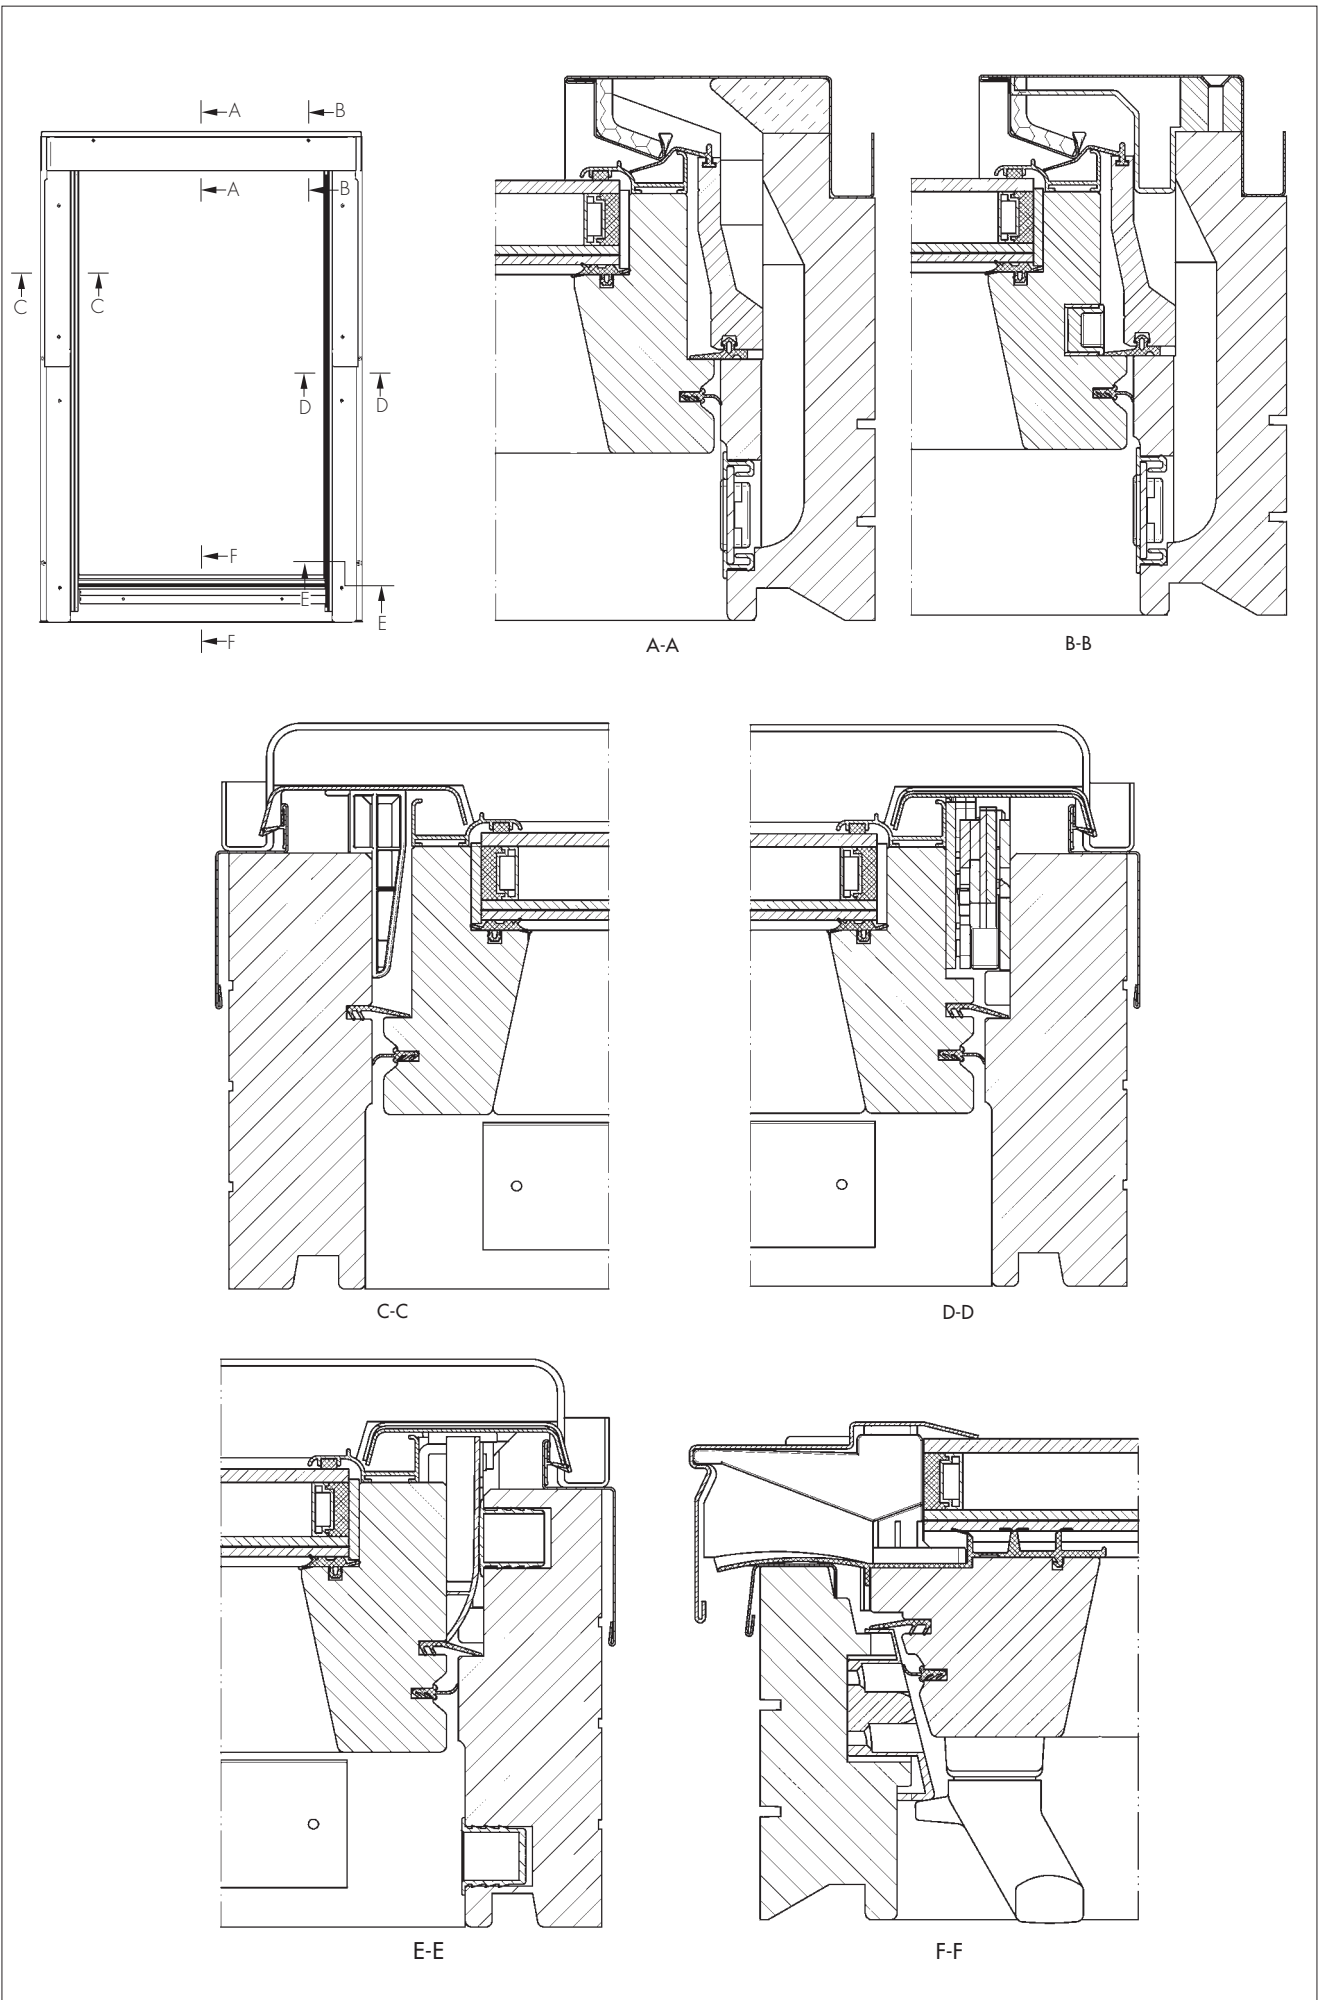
FTS-V Centre Pivot Roof Window cross-sections
